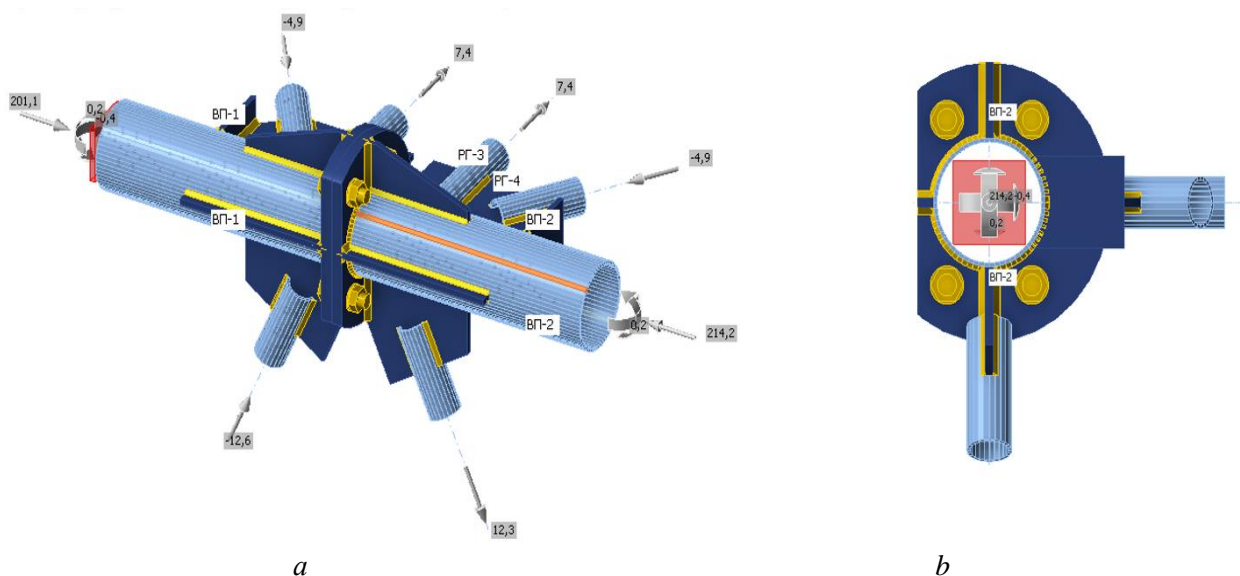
General view of Model 2 of the analysed joint with bolted connection and welds (a). Cross-section of the flange connection (b).
